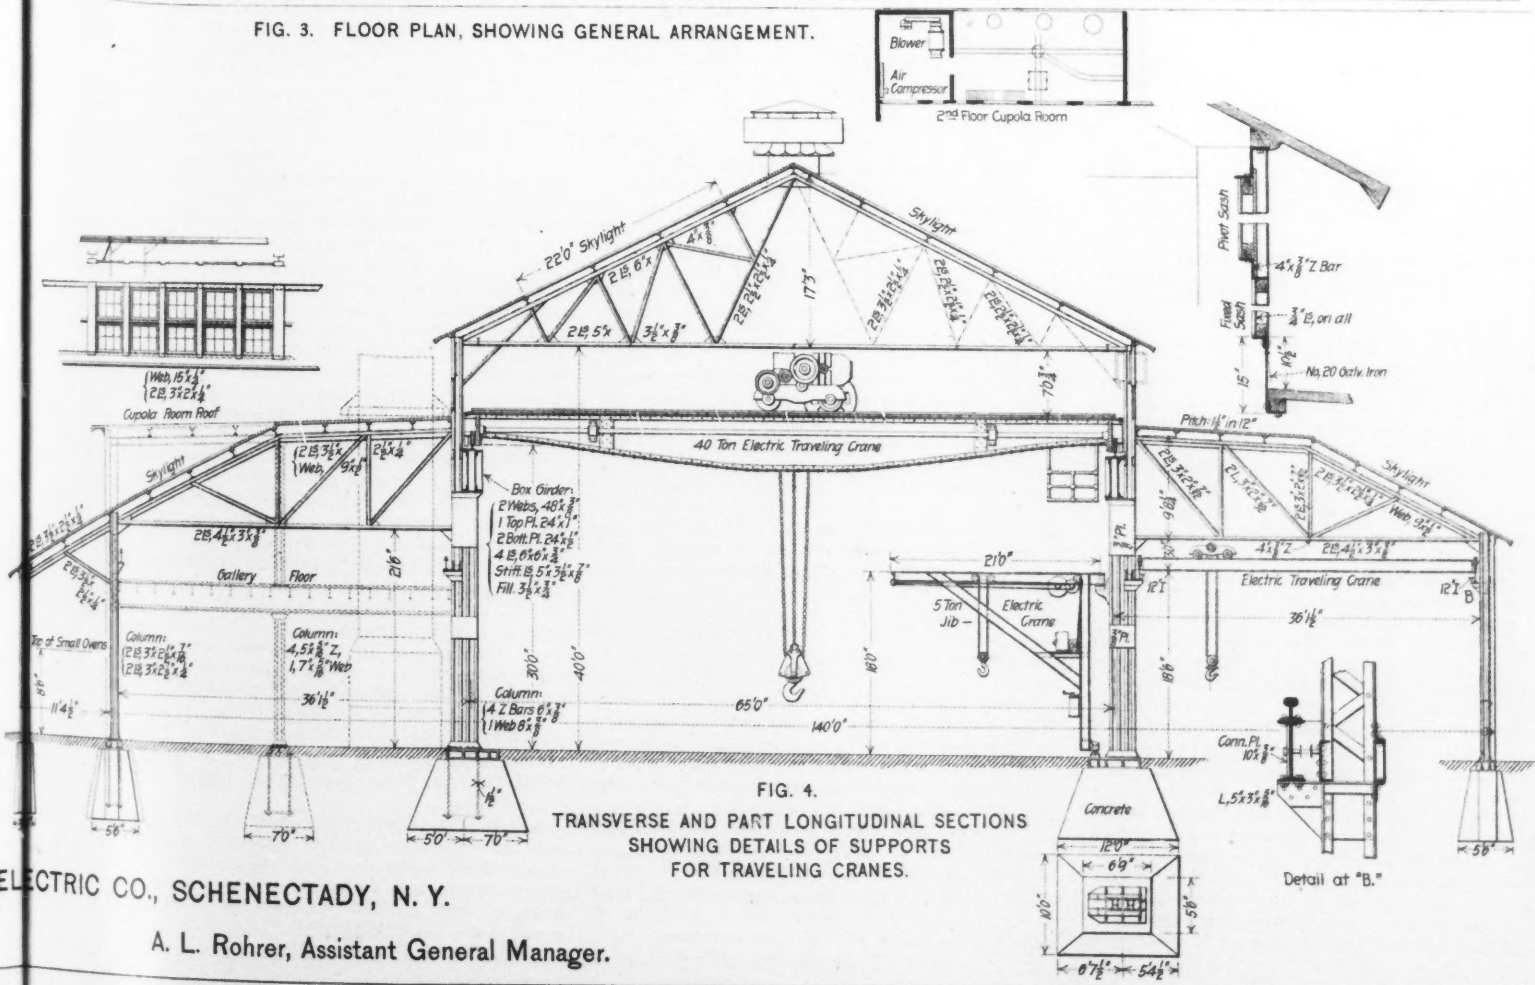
TRANSVERSE AND PART LONGITUDINAL SECTIONS SHOWING DETAILS OF SUPPORTS FOR TRAVELING CRANES.
